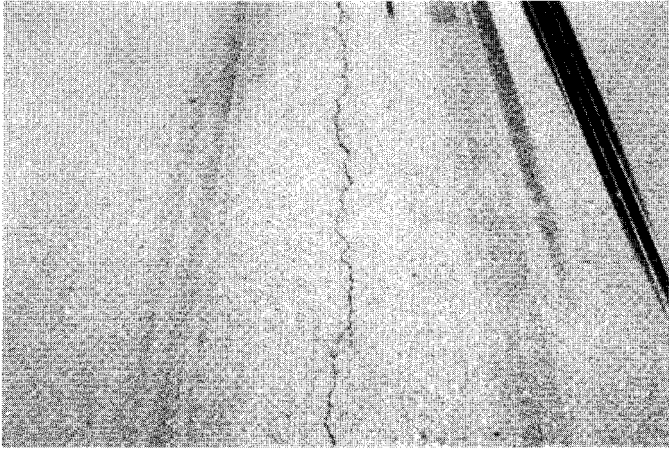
Low-Severity Joint Reflection Cracking, Nonfilled Crack
